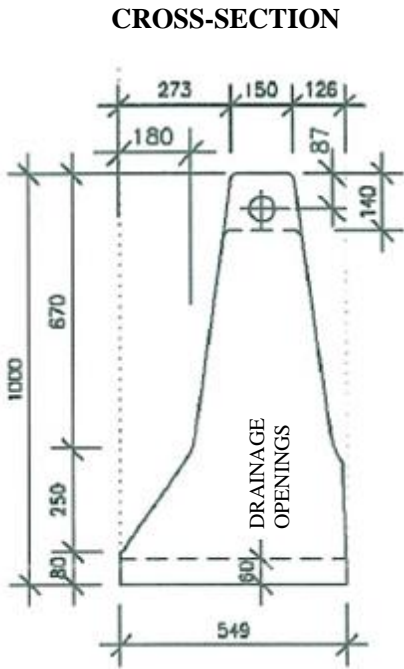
Single sided concrete barrier 1 m height – common and end part
